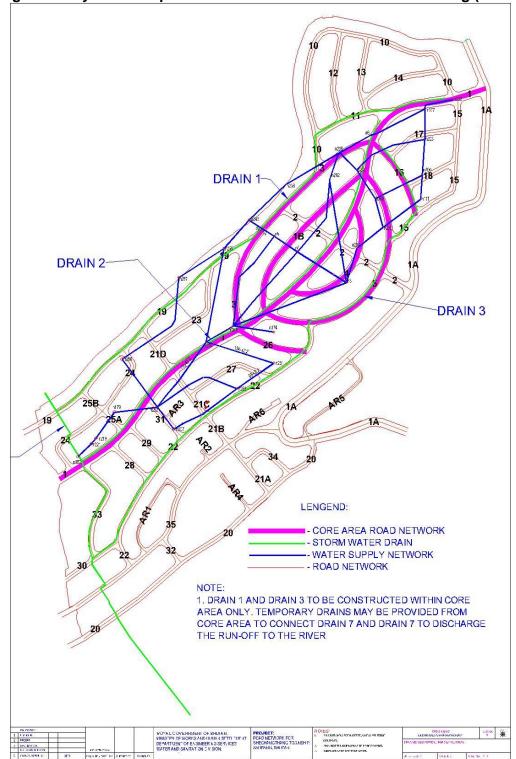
Layout of Proposed Storm Water Drains in Shechamthang (Ranibagan)
